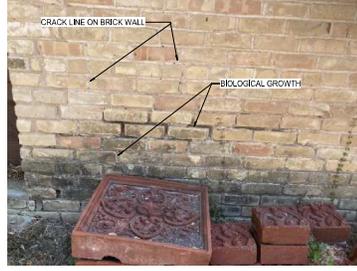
BRICK CRACKS AND BIOLOGICAL GROWTH ON SOUTH FACADE. DATE: 2022-JUL-30.
